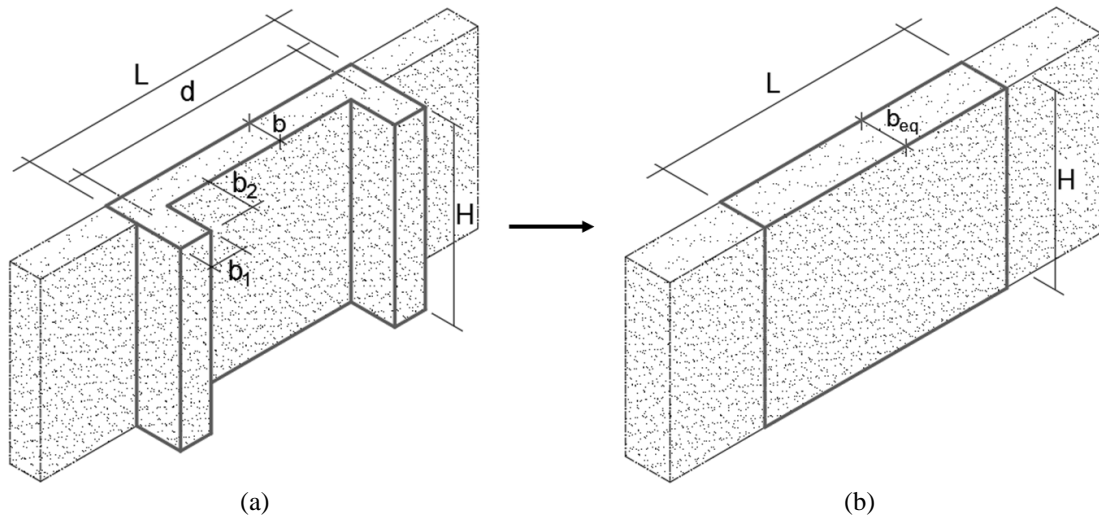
Diagram of the reinforced wall section and conversion of (a) a type C wall to a typology of (b) wall with equivalent thickness
